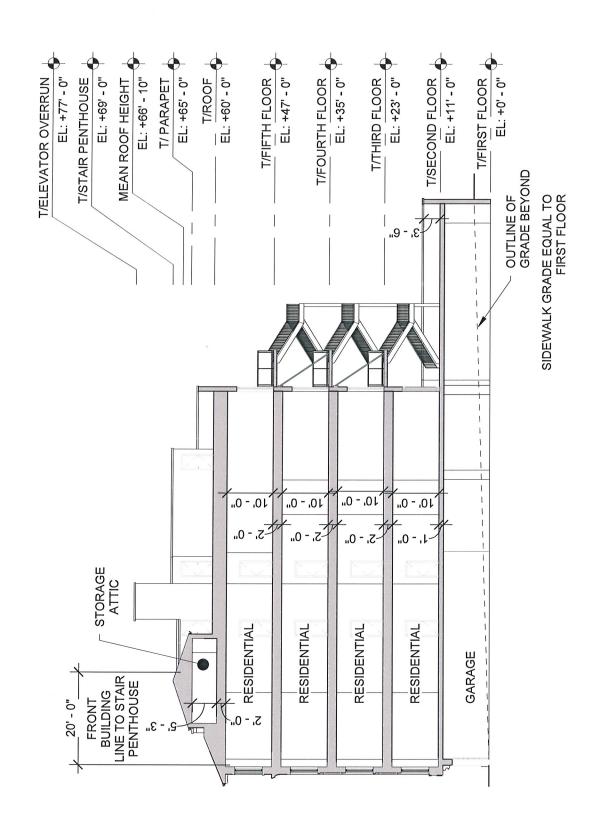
PROPOSED BUILDING SECTION 20' 40' SCALE: 1" = 20'-0'
